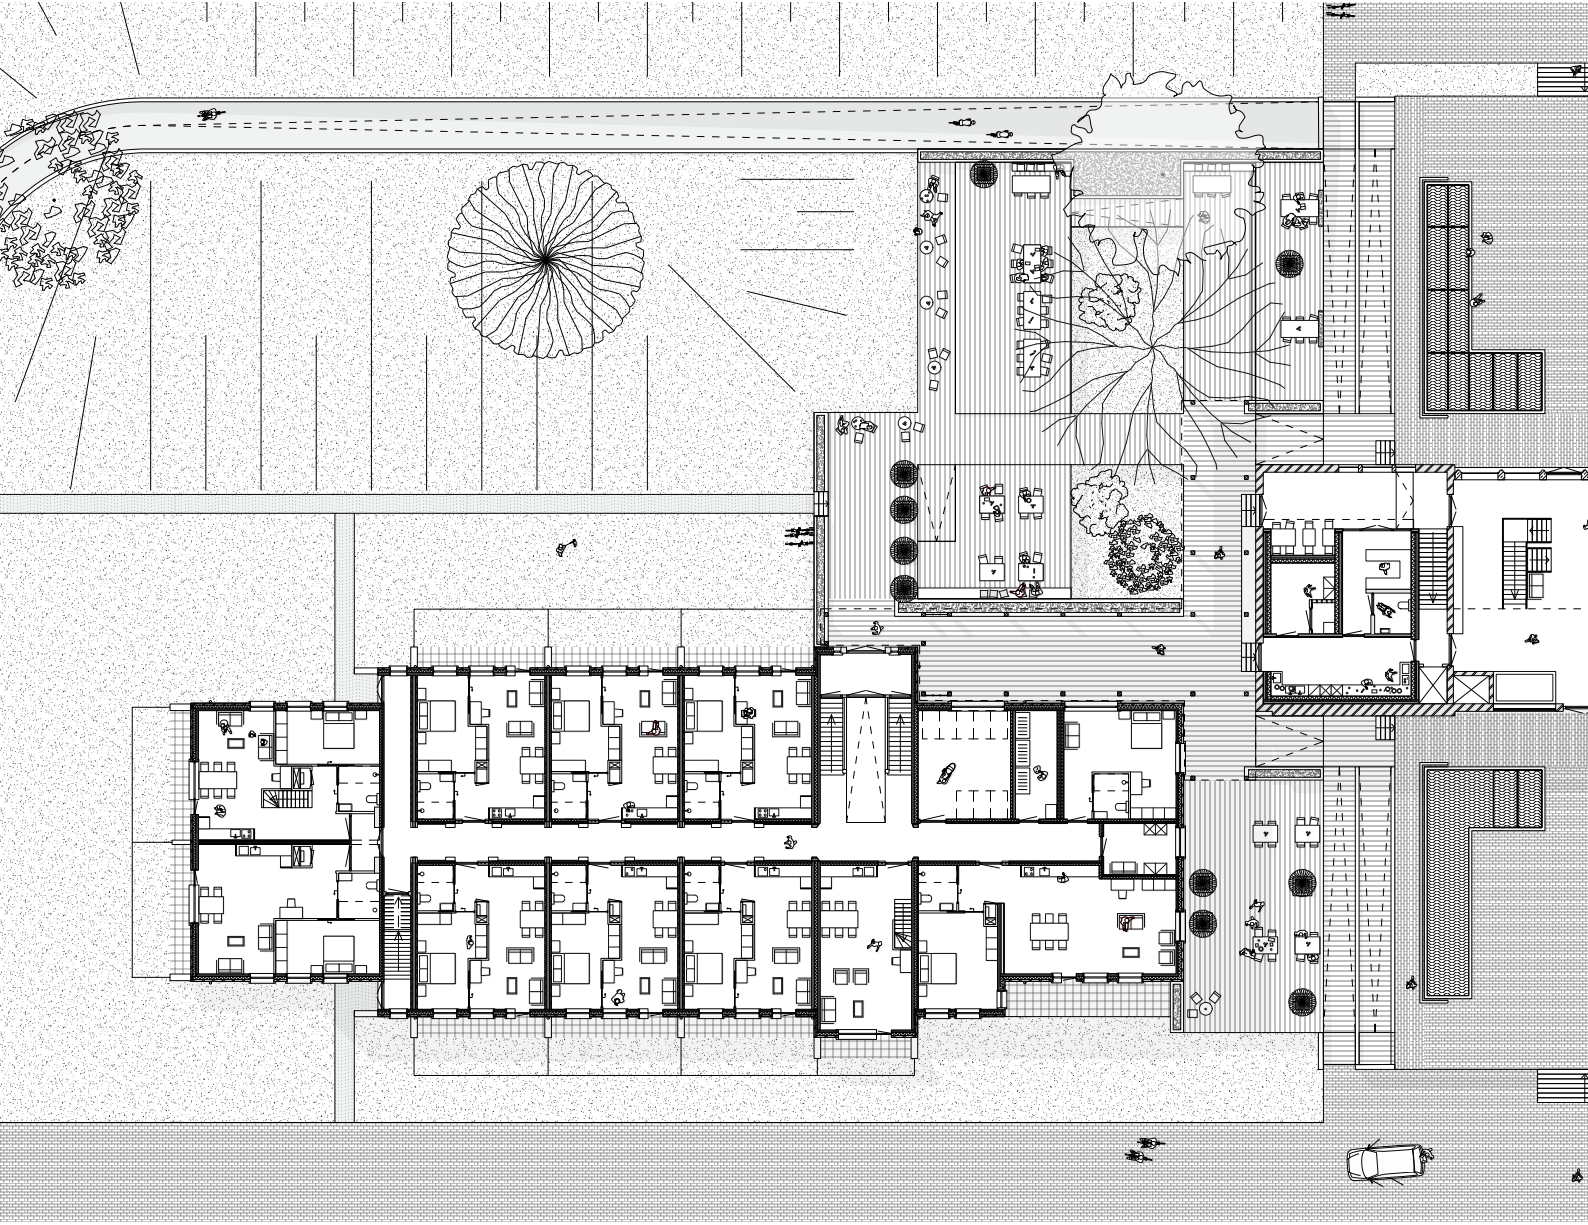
Ground floor plan scale 1.200 (scaled to fit page)
